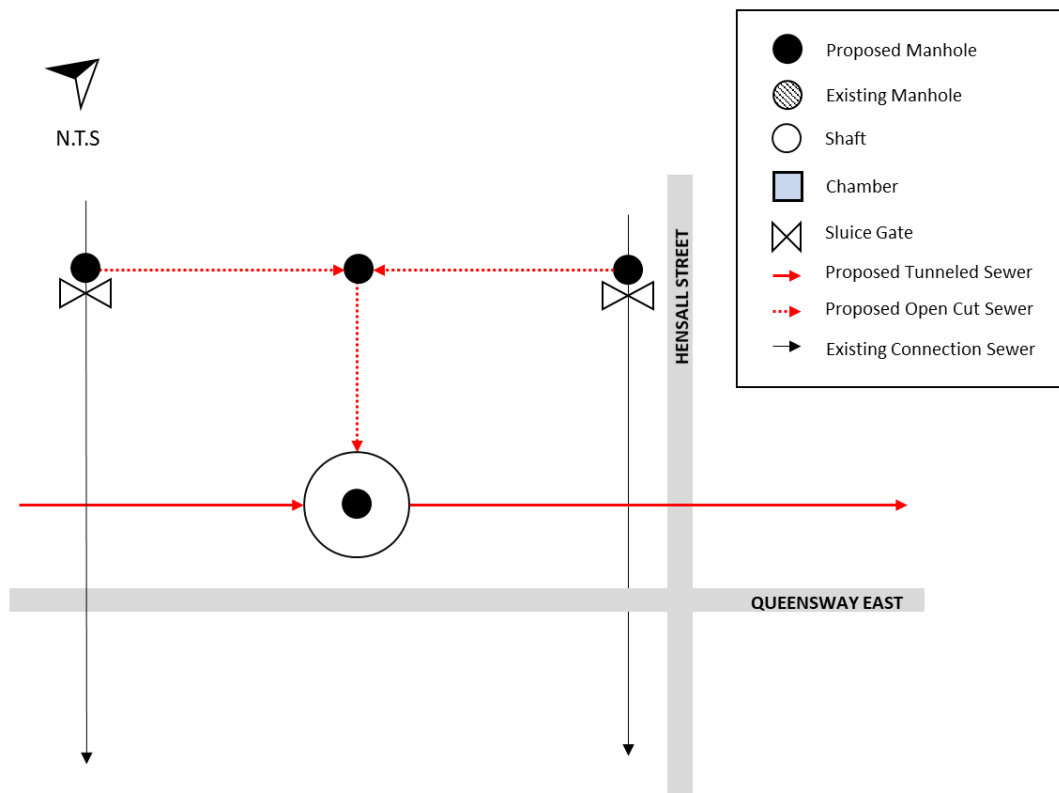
Queensway East and Hensall Street Connection Type Schematic
